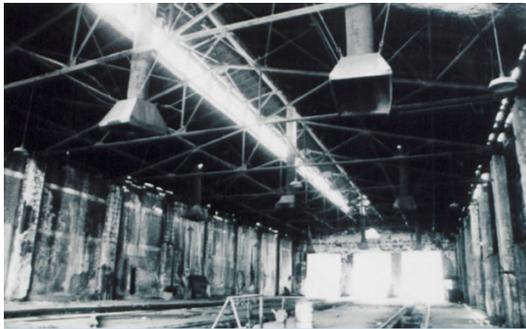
Interior of the atelier buildings depicting the roof and column details before the restoration. (Source:
